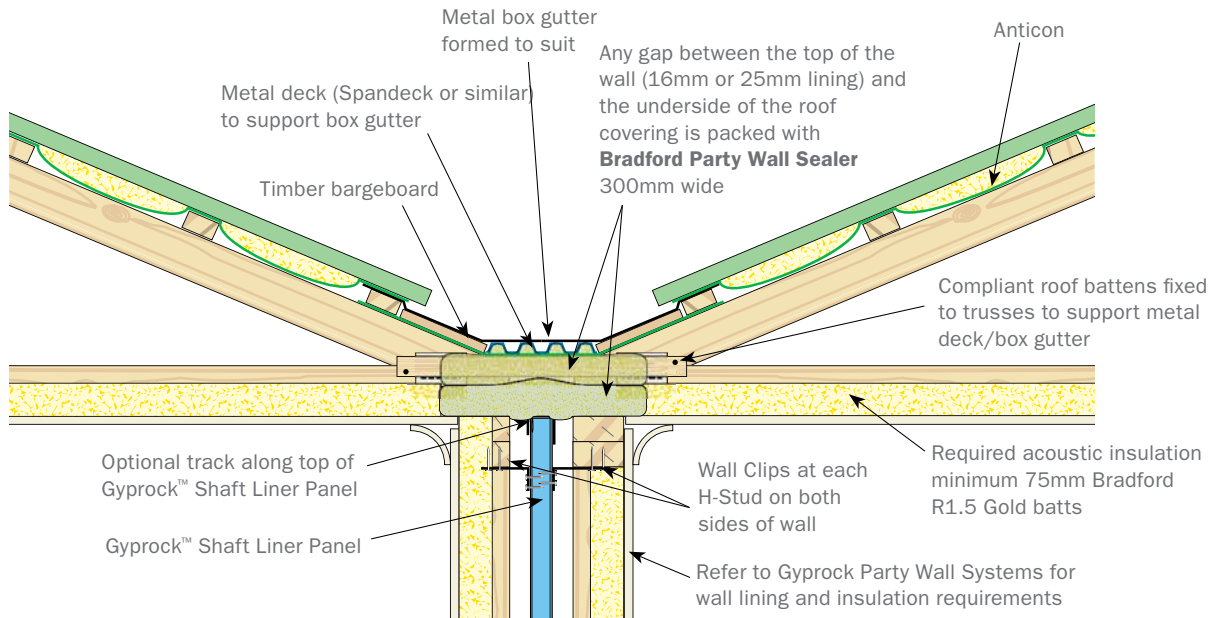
Typical ceiling/roof parapet (Gyprock Party Wall)
